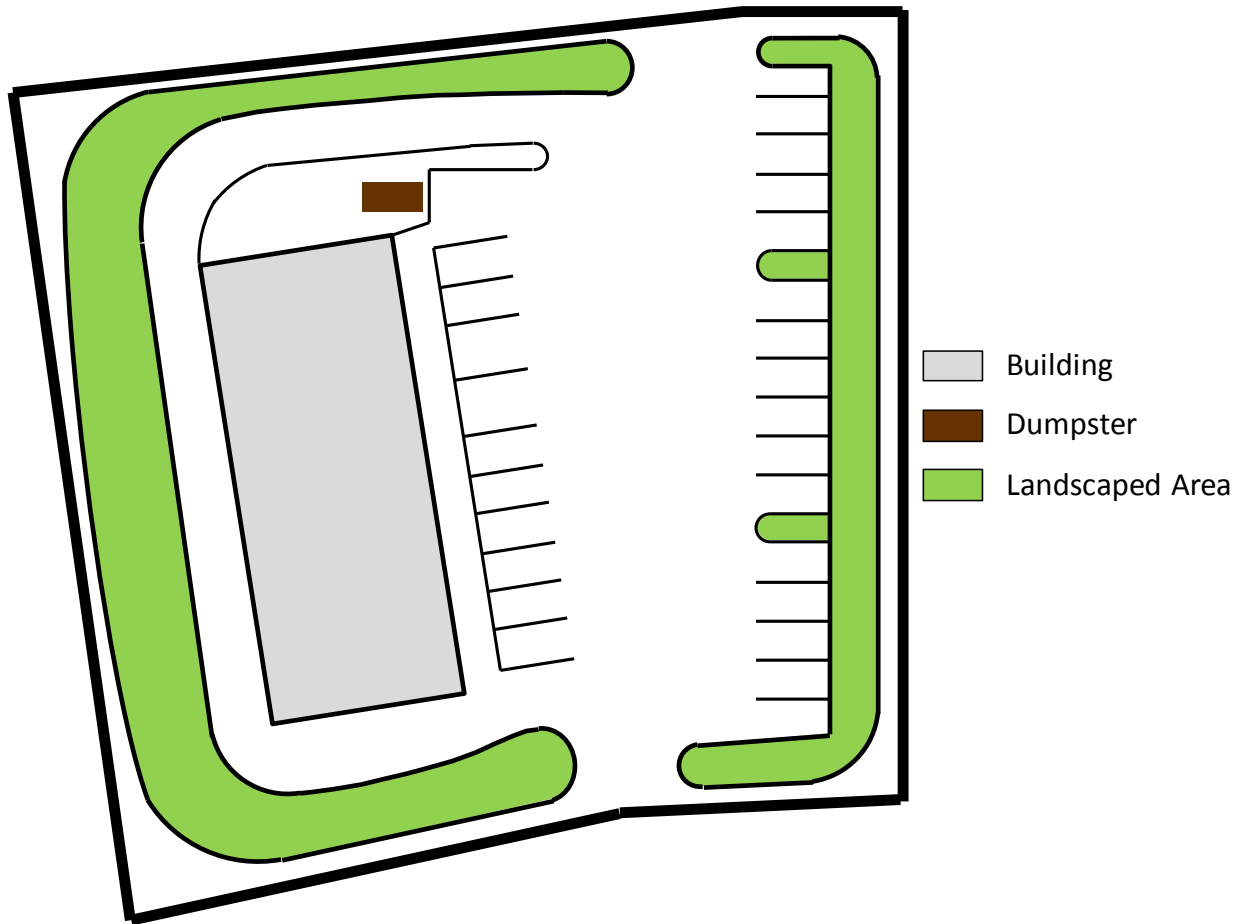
EXAMPLE 3 DEVELOPMENT PLAN
